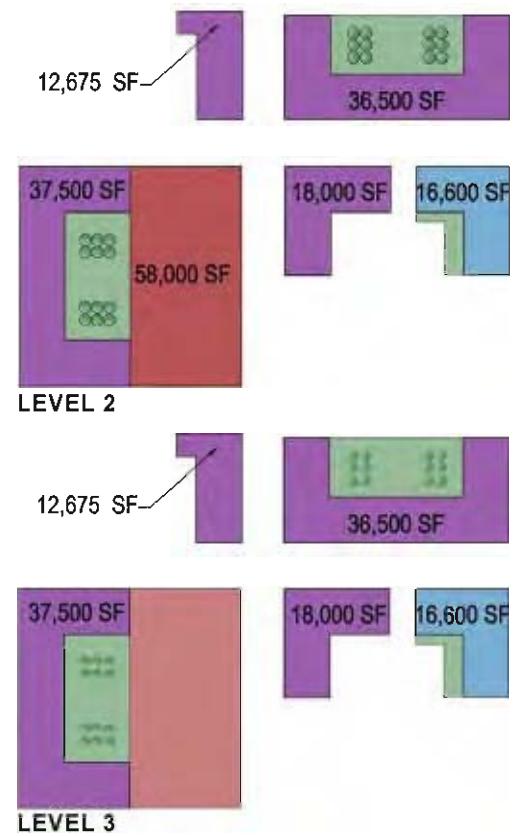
SITE PLAN PROGRAM DIAGRAMS
